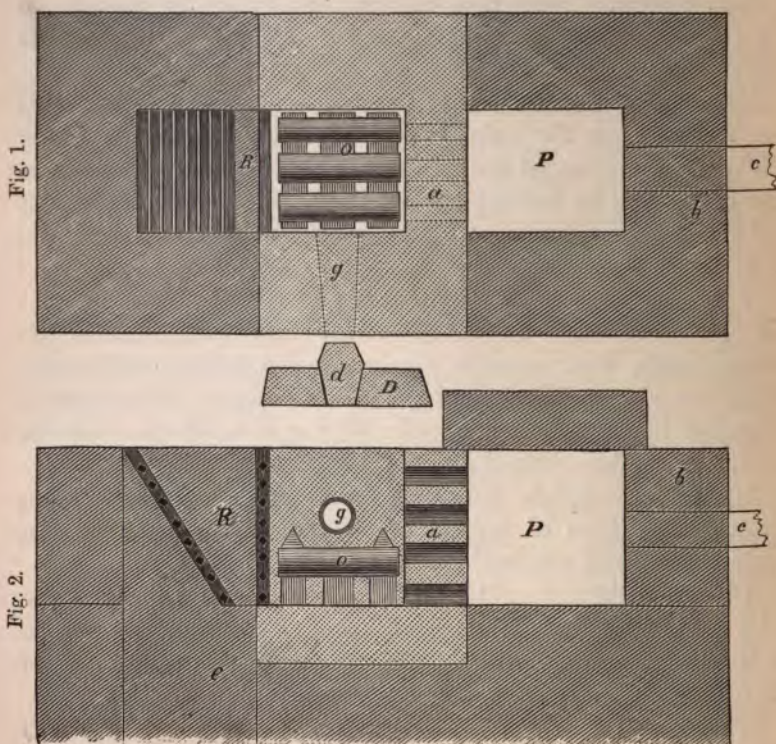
is a ground plan of the sample kiln. Fig. 2, a longitudinal section of the same to a scale of one-eighth of the full size.
